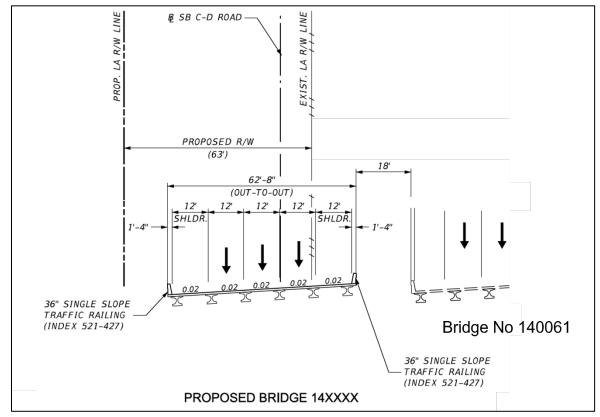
Typical Section of Proposed C-D Road Bridge over Cypress Creek
